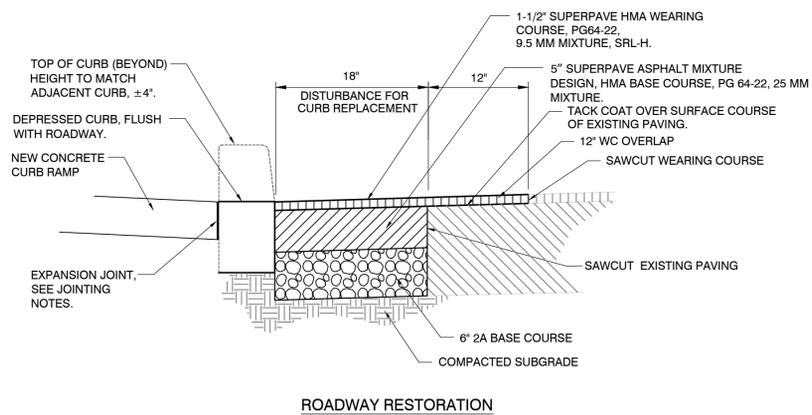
DETAIL- CONCRETE CURB AND ROADWAY RESTORATION
